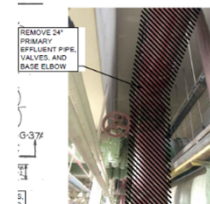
PRIMARY EFF. PIPE IN TUNNEL
